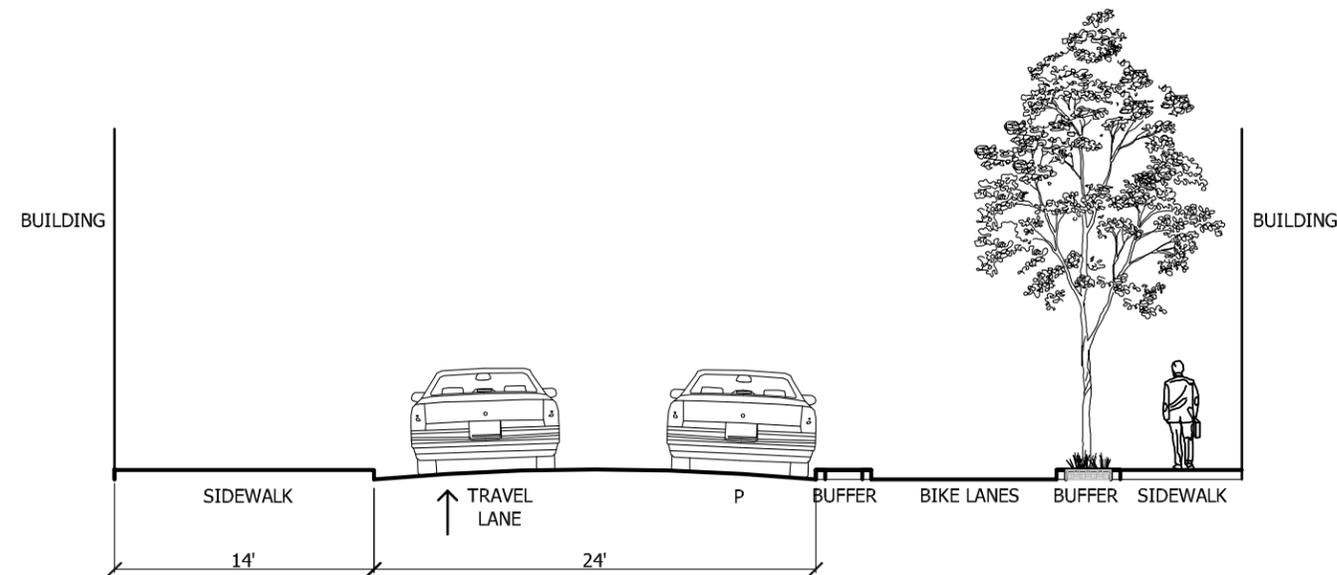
Possible configuration for Smith Street between Sigourney Street and Bay Street
